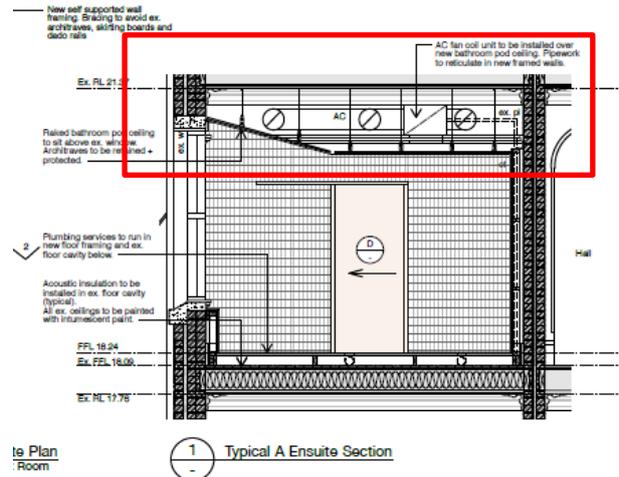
Ensuite A section, note the installation of AC in void between pod and extant ceiling
